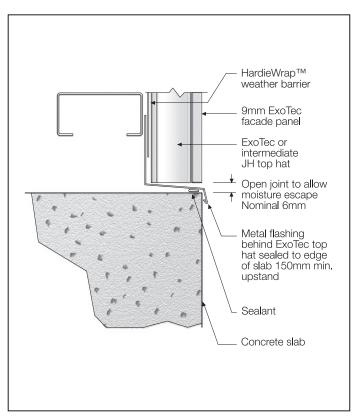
WALL BASE TYPICAL DETAIL 2
